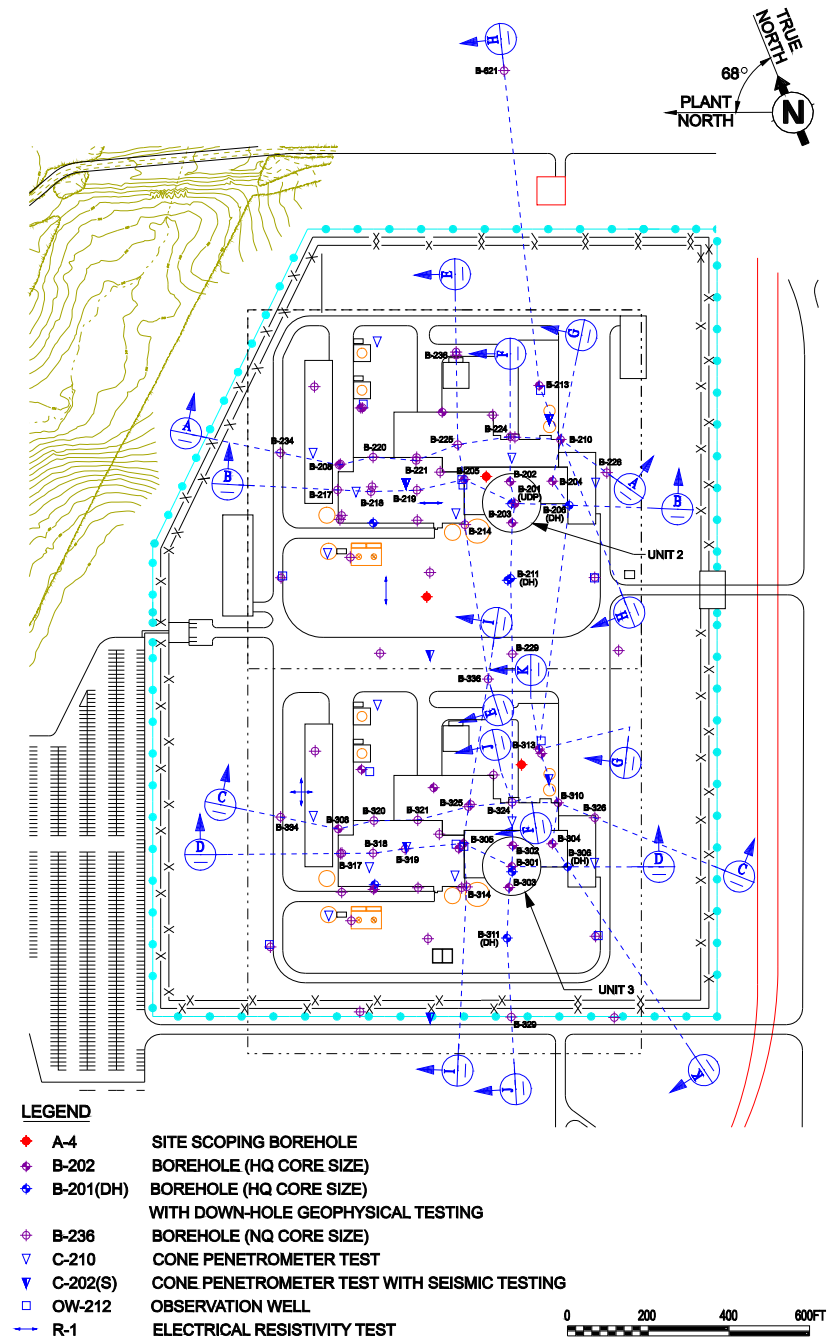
Boring Location Plan with Subsurface Profiles (Power Block)
